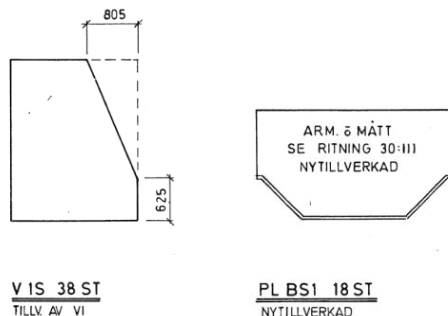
Details from the construction drawings of the new building in Olivedal, showing modifications to reclaimed element V 1S (left) and specifications for a new element (right).
